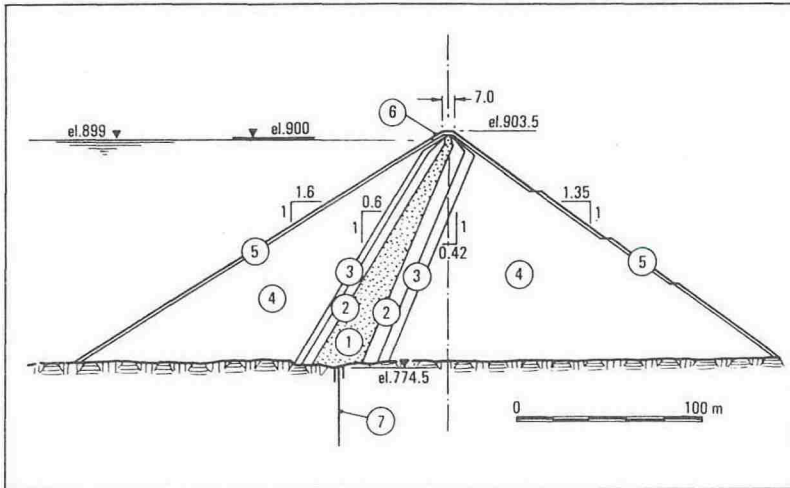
Cross section of the Svartevann dam, Norway, where:
